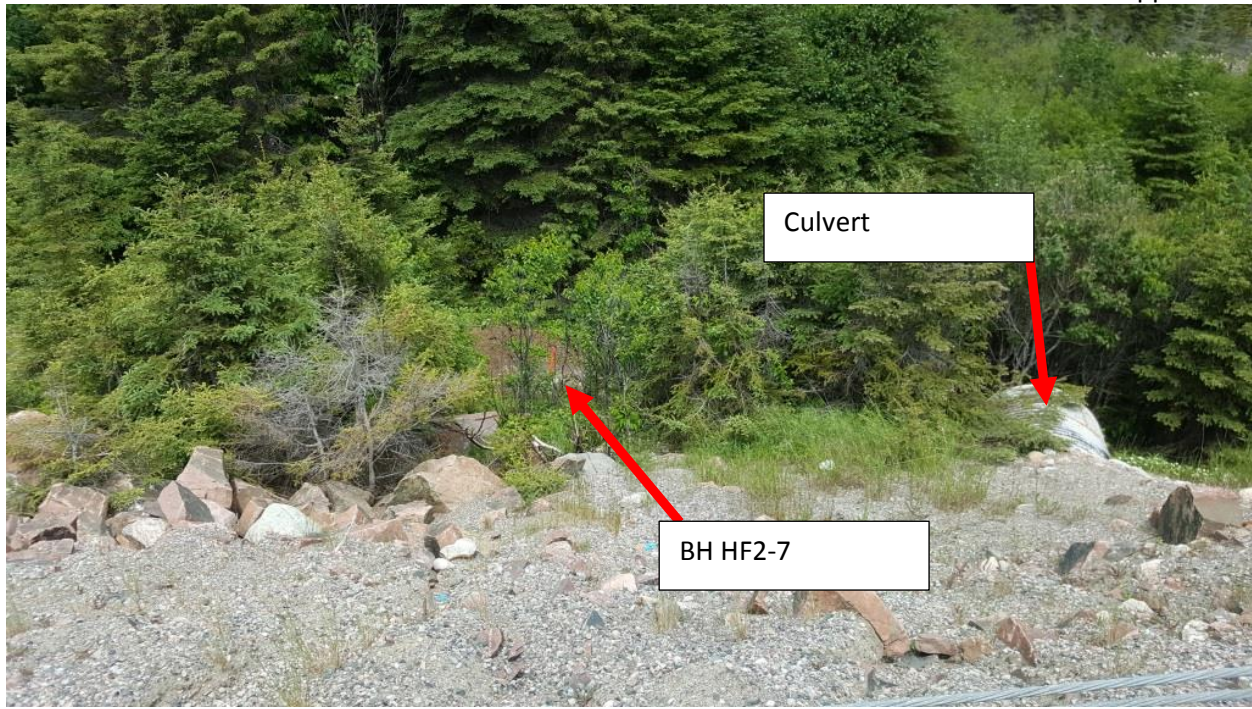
Looking toward north – Culvert at Sta.14+230 and BH HF2-7 (June 2017)
